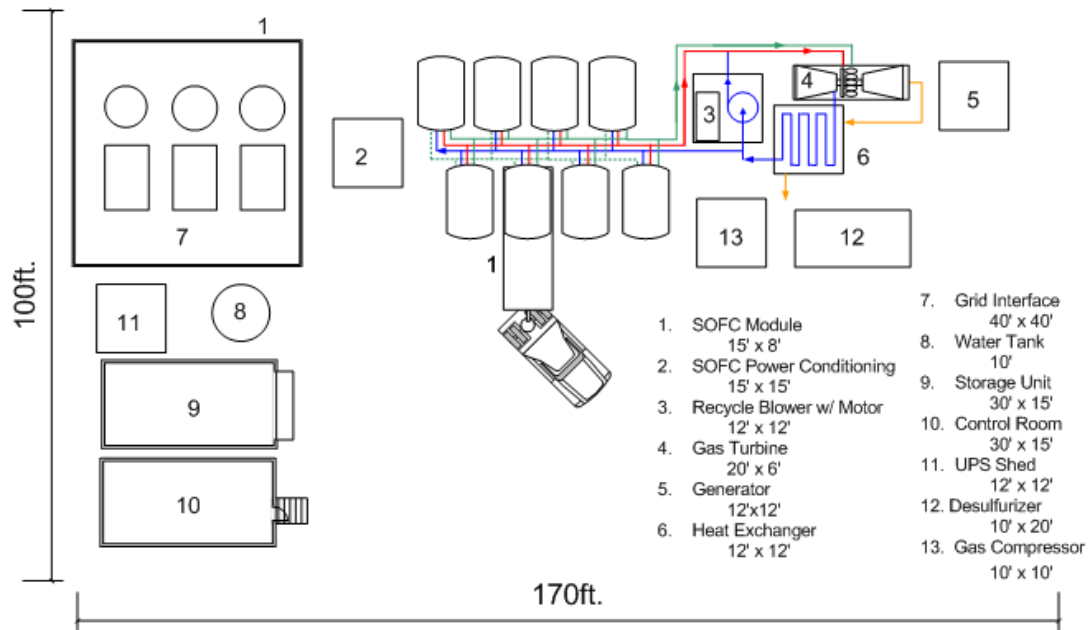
Twenty-five MW SOFC-GT hybrid plant layout
